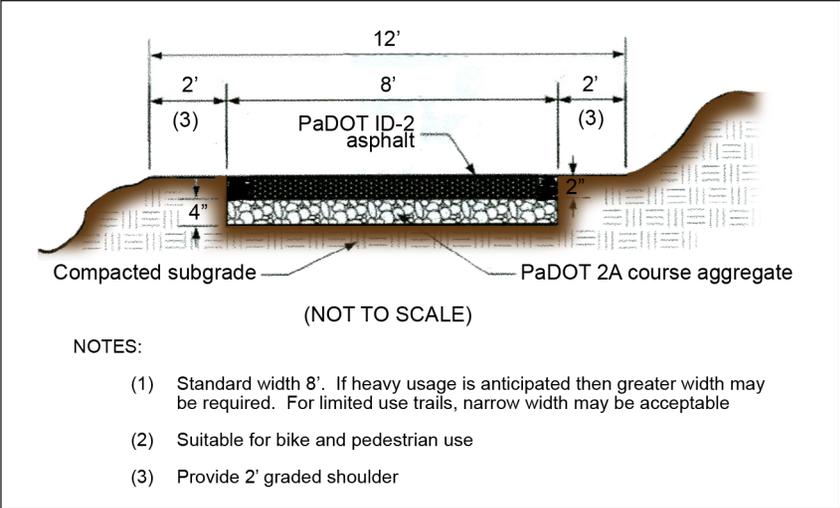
Core Circulation Trail Section, Asphalt Surface
